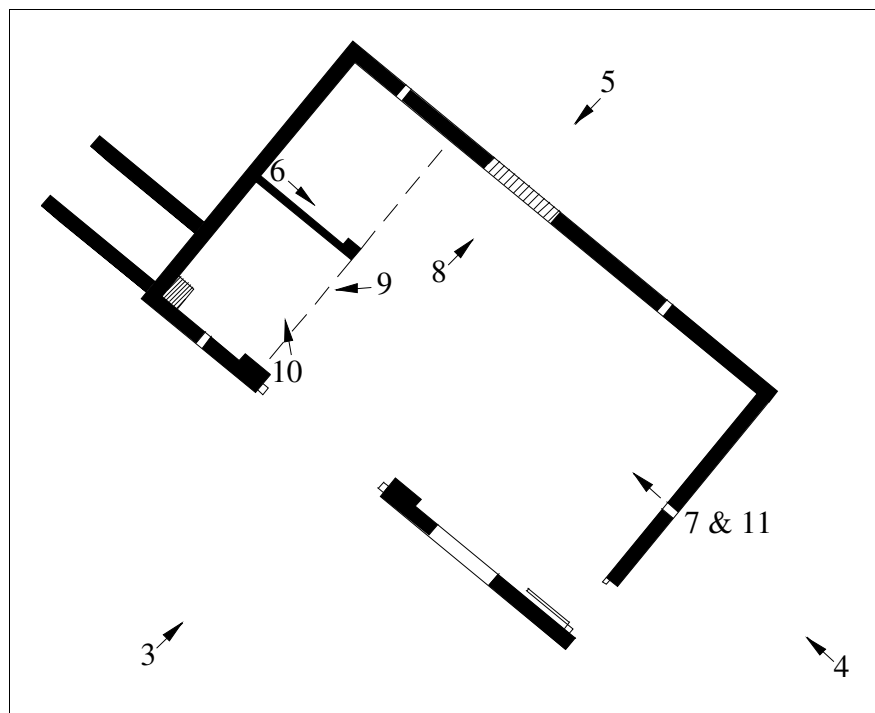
Plan of Building 1 showing directions of photographs 3 - 11
